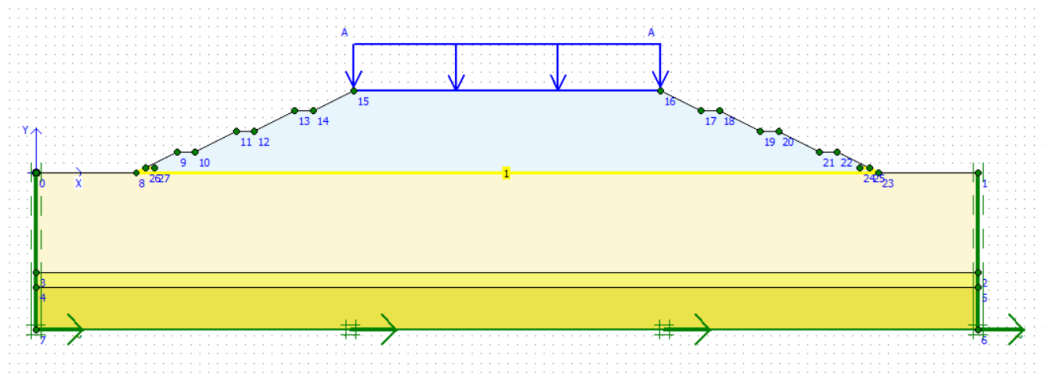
Embankment 3 Trap with Geotextile Reinforcement
